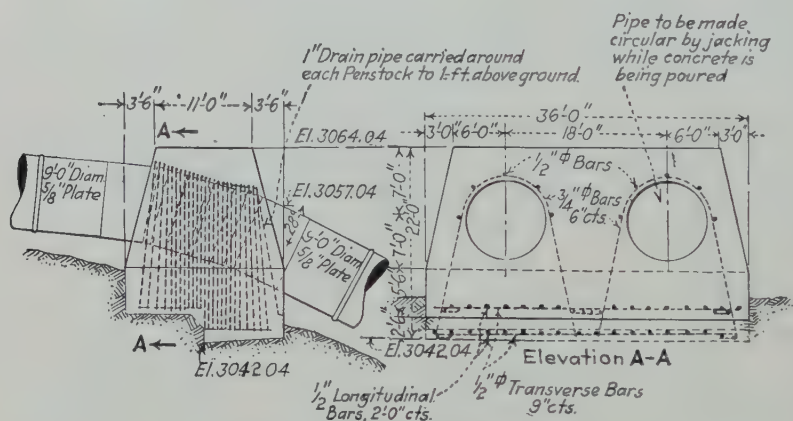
Details of anchorage in penstock line, Pit River 1 development.
